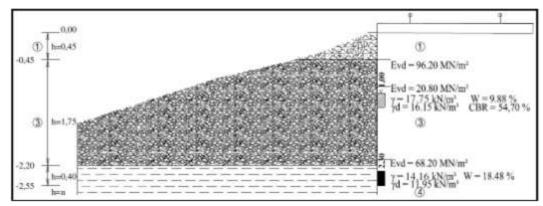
View of embankment on new track of railway route 1. crushed stone surfacing, 3. embankment, 3.basic soil
